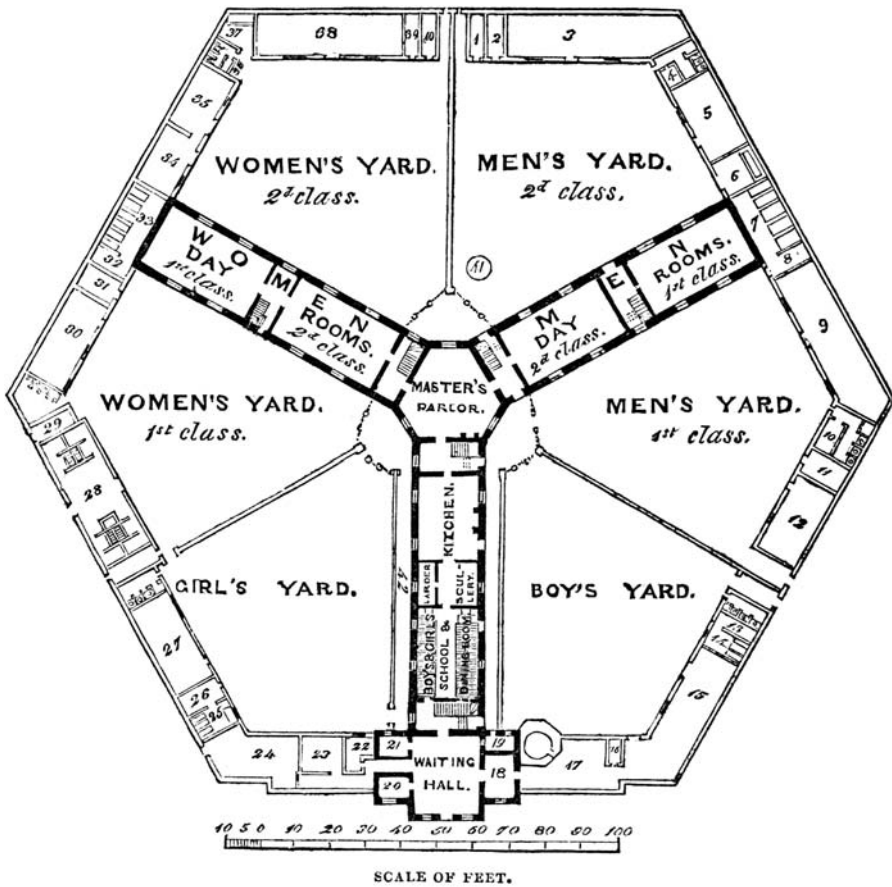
Ground floor of hexagonal workhouse, 1835.
